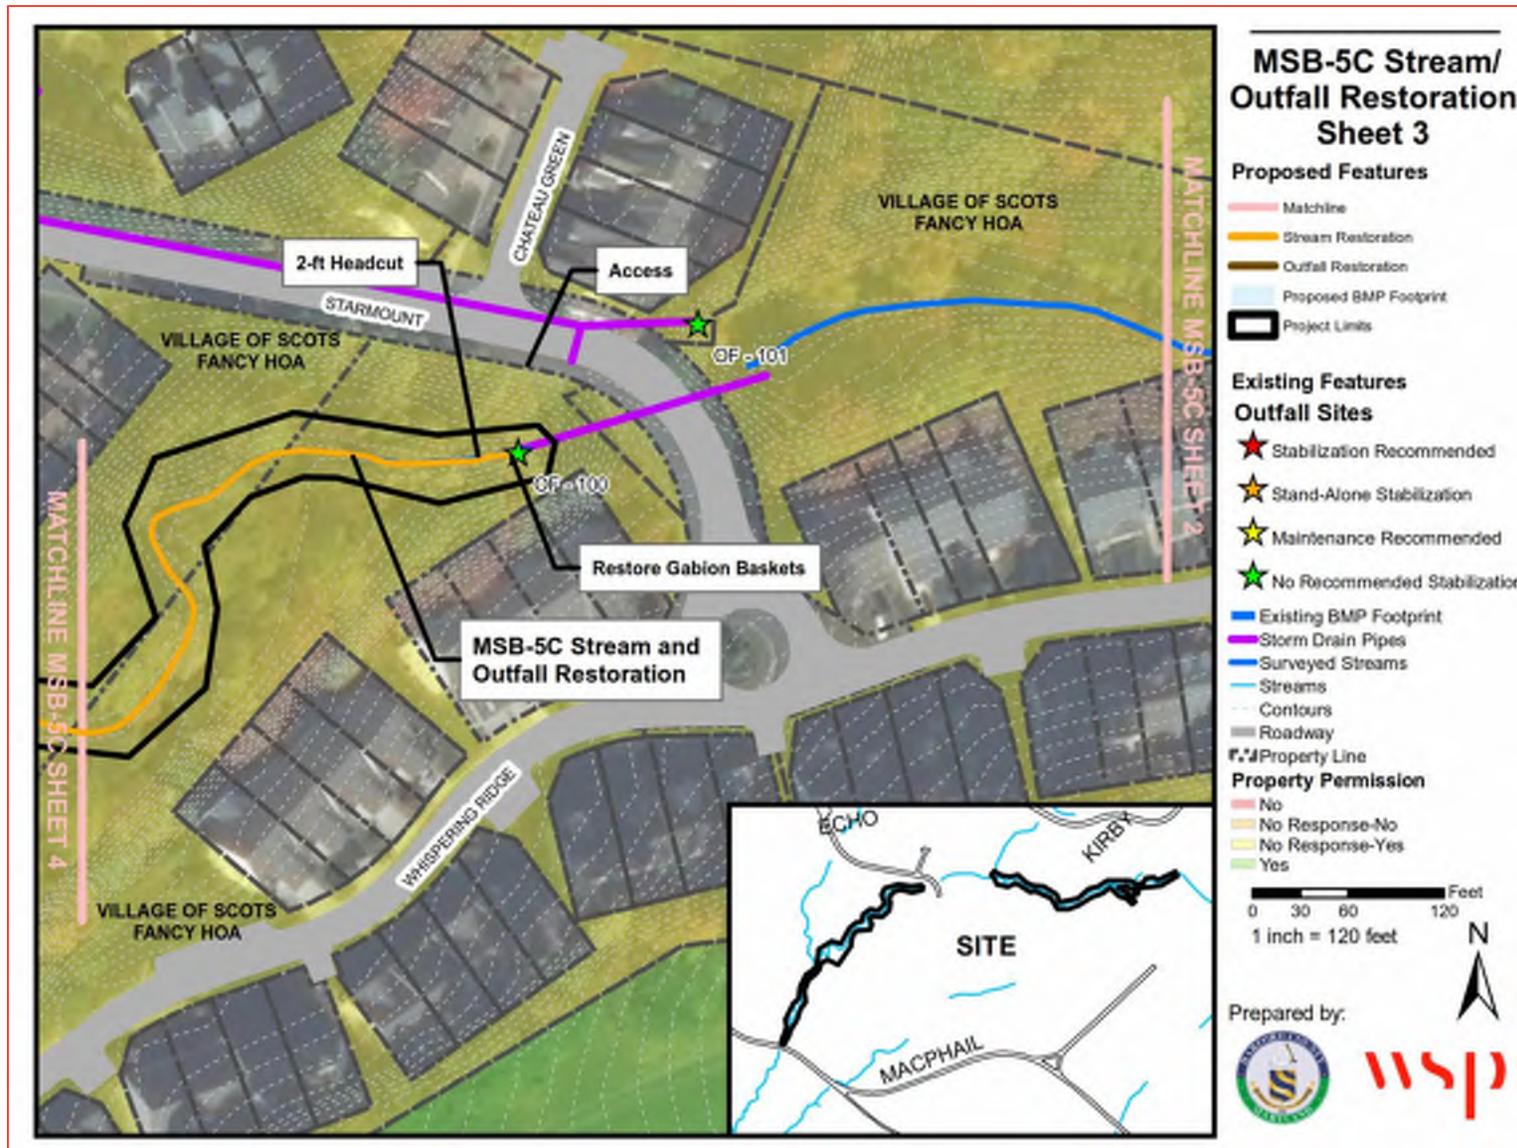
Site Location and Proposed Project Plan for MSB-5C Stream and Outfall Restoration (Sheet 3 of 5)
